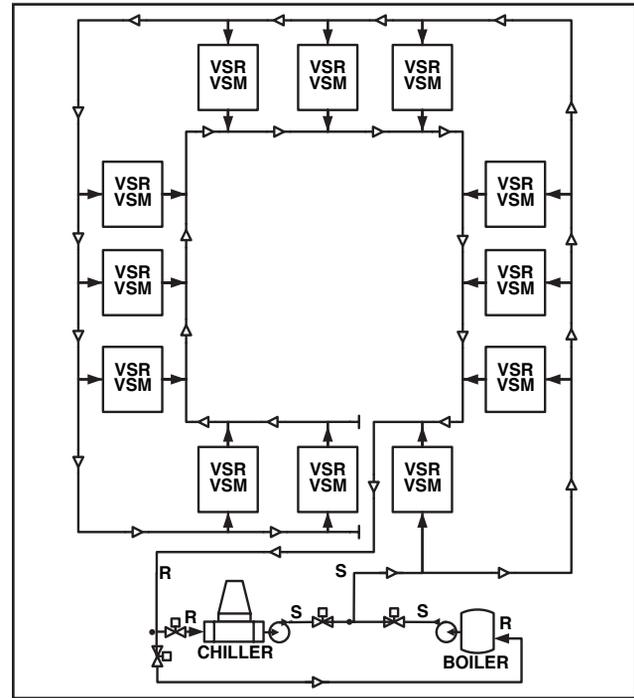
Piping Layout for a Horizontal 2-Pipe System with Standard Return Piping
